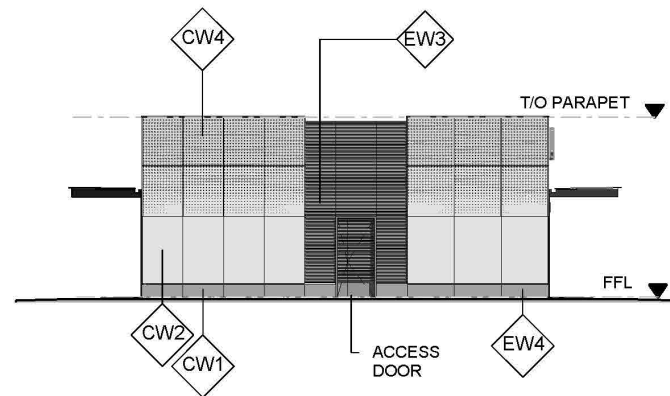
Platform Access Module with Tunnel platform access, side elevation
